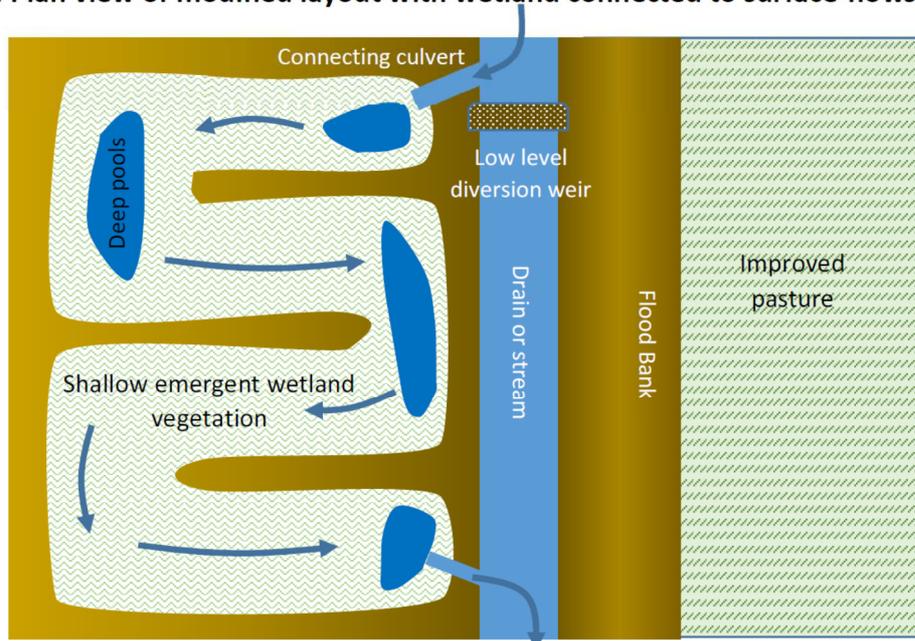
Conceptual plan for potential wetland construction in lake-edge areas currently perched above surface-water flows. Excavated soil materials from wetland construction could be used to raise the ground level of adjacent farm land to reduce flood risk and improve drainage, thereby increasing the agricultural value of this land.
